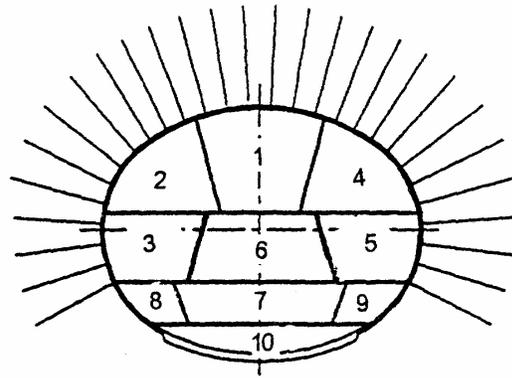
Top heading and bench method of excavation. Temporary support consists of a 200 mm thick shotcrete shell with 4 and 6 m long untensioned grouted rockbolts at 1.0 - 1.5 m spacing
